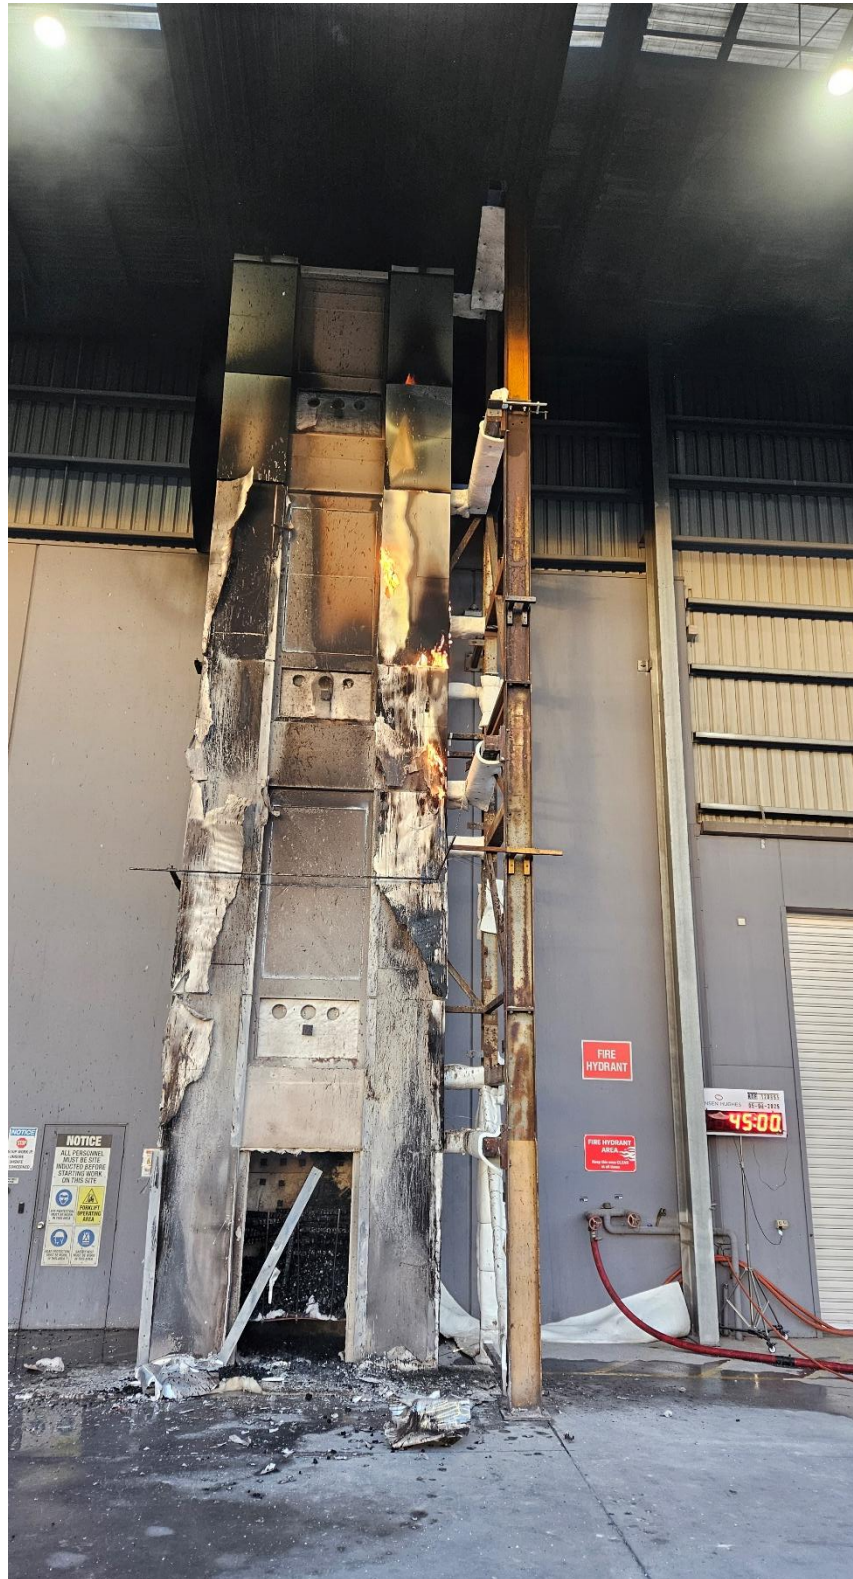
The external wall system – 2 minutes 30 seconds after crib was extinguished
